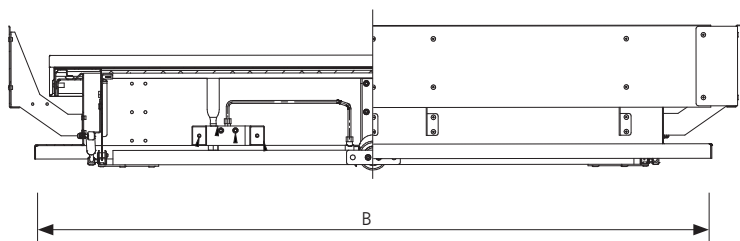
Section B-B of mcr LAM louvered smoke vent in closed position (roof installation)
